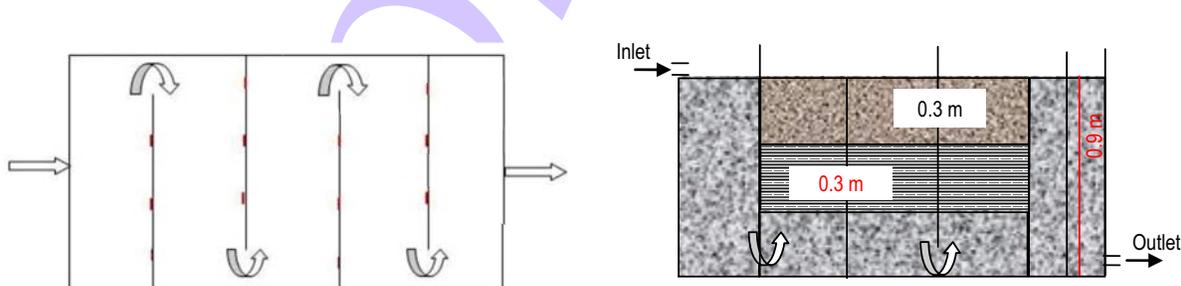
(a) Plan View and (b) Sectional View of Wetland Unit
